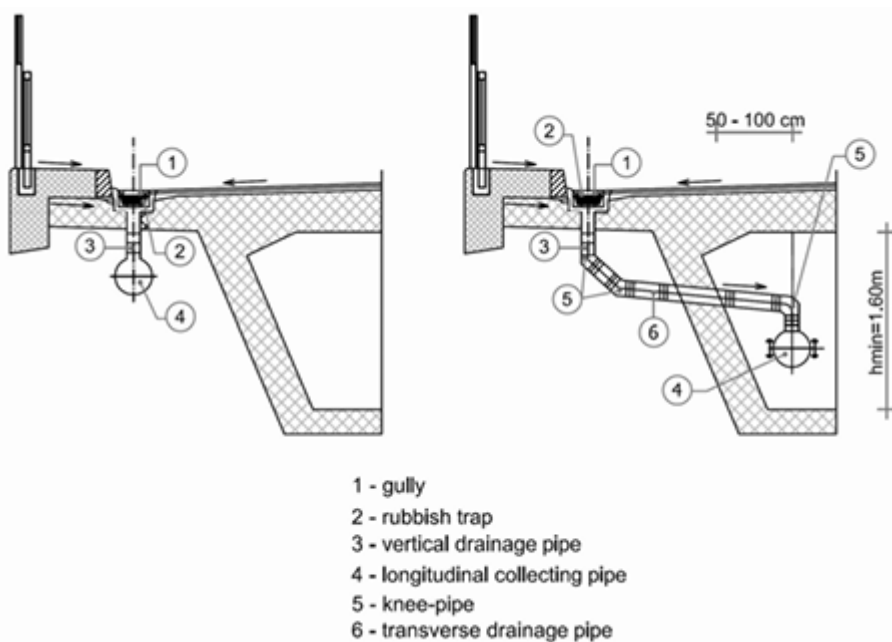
Methods of placing drainage elements outside and inside of box section
